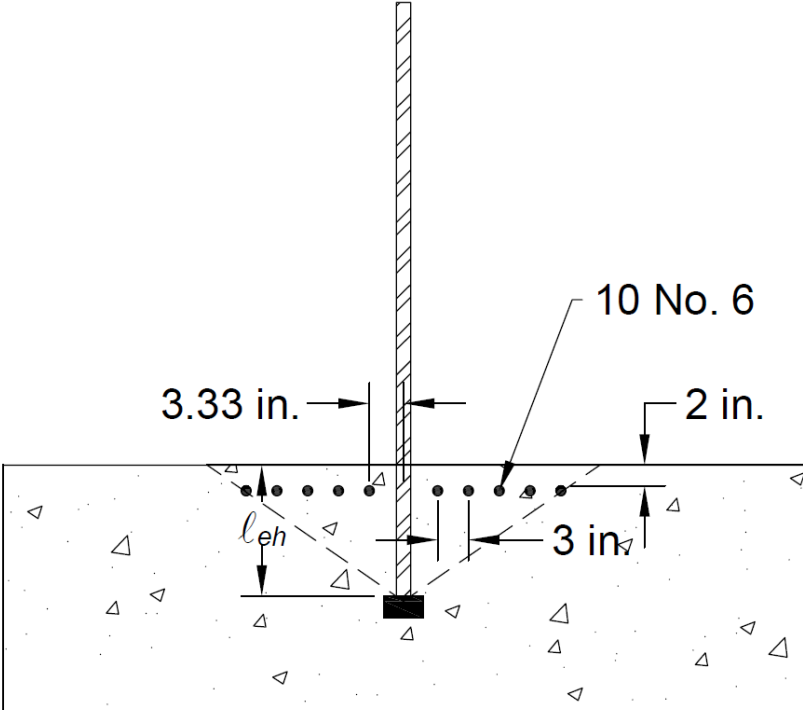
Cross-section view of slab specimen 11-5-S5.5-10#6-0-12.75 with no parallel ties
